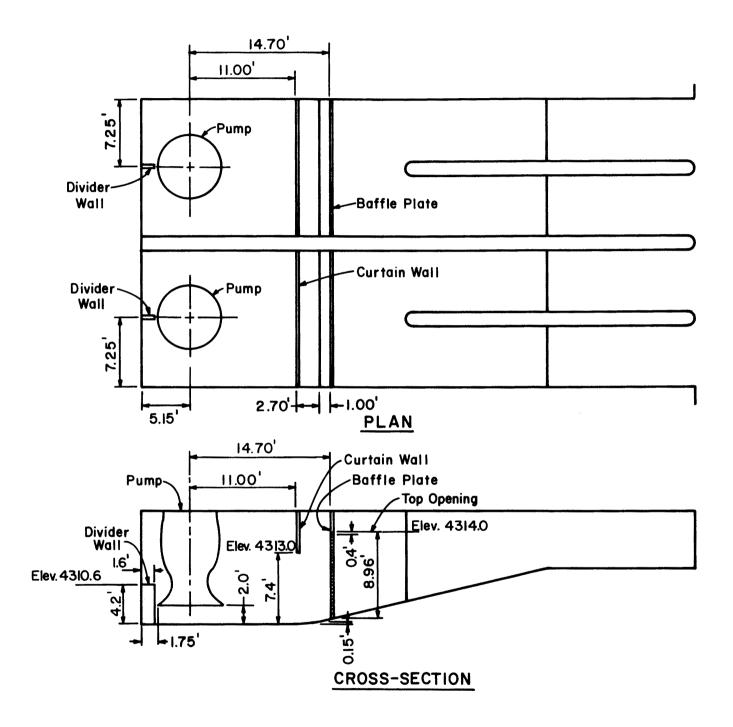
Recommended Modified Sump with Baffle Plates, Curtain Walls and Divider Walls in Place
